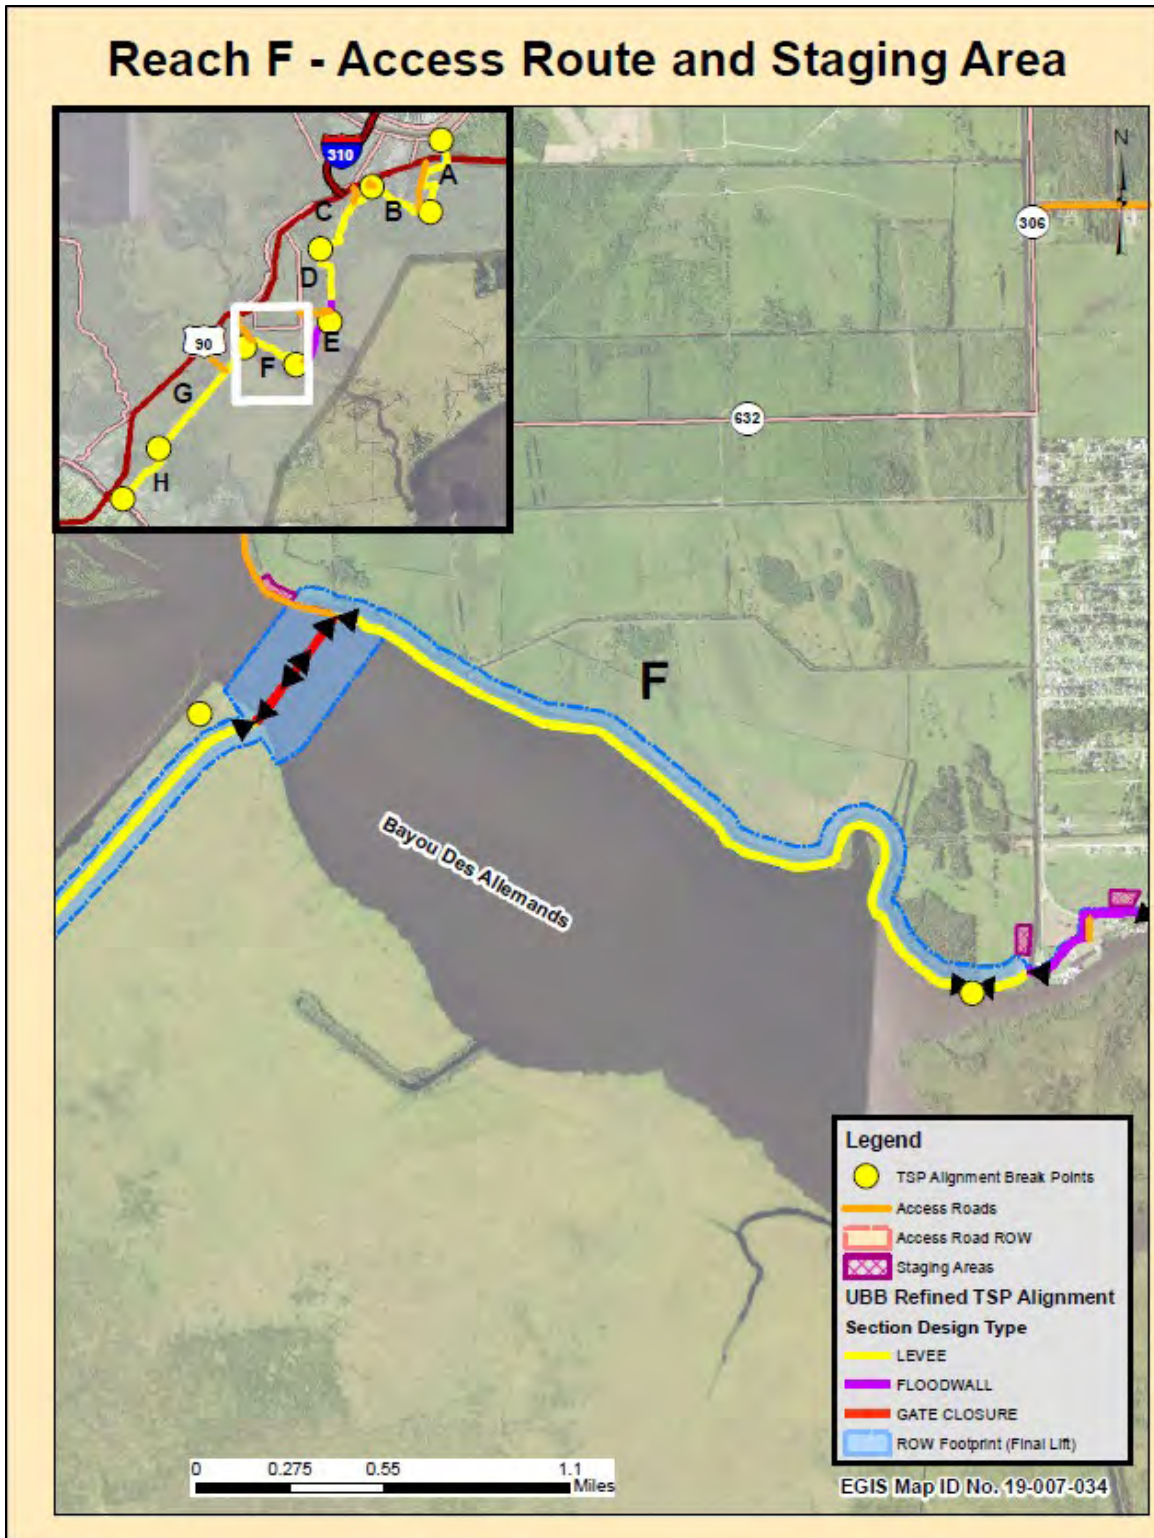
Hydraulic Reach F Access Road and Staging Areas
